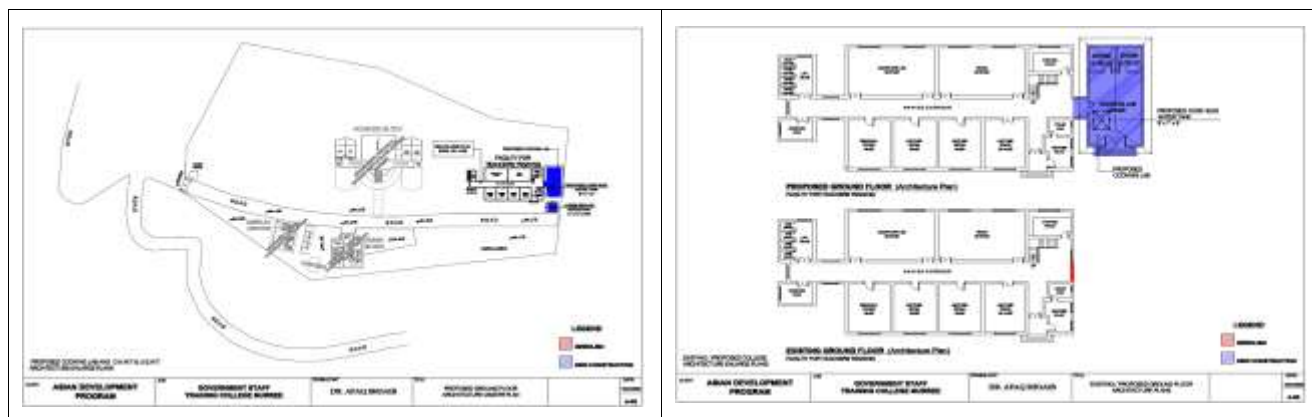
A: Designed Layout plan new facilities (Cooking Lab) GSTC Murree, Rawalpindi
